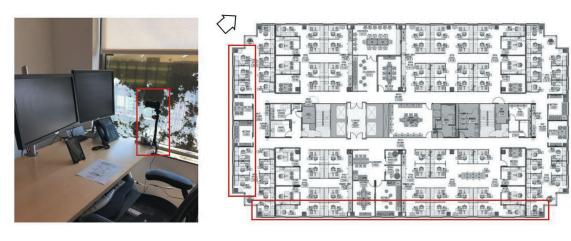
A picture of a workstation showing camera location (left), and a typical floor plan highlighting workstations on the SW and SE facades (right).
